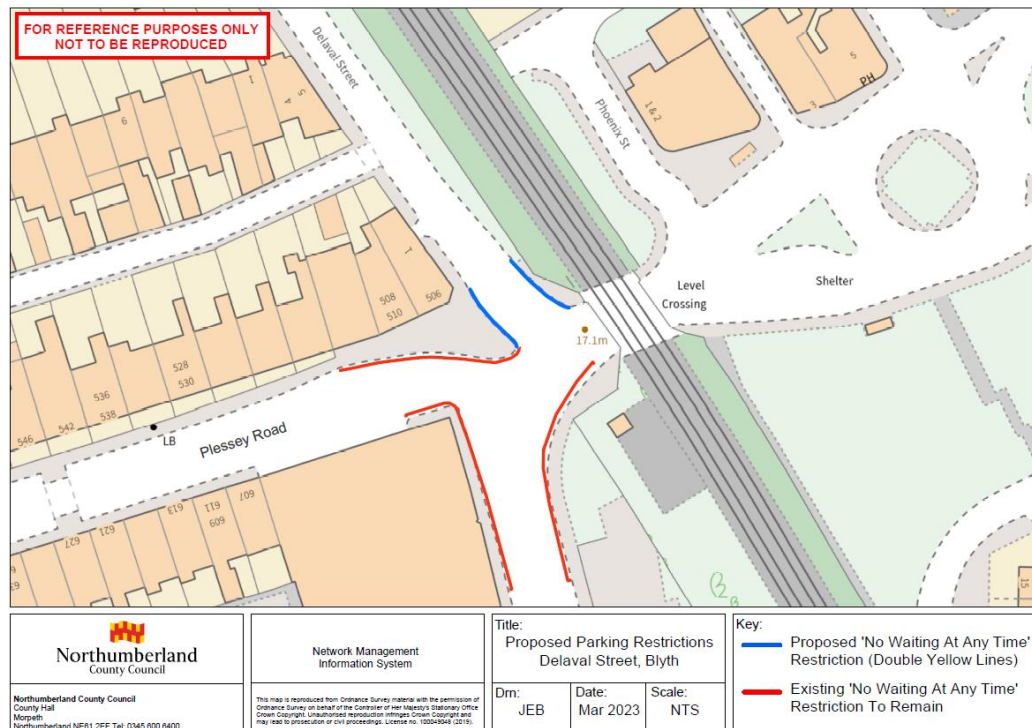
Proposed 'No Waiting at Any Time' restrictions on Delaval Street
